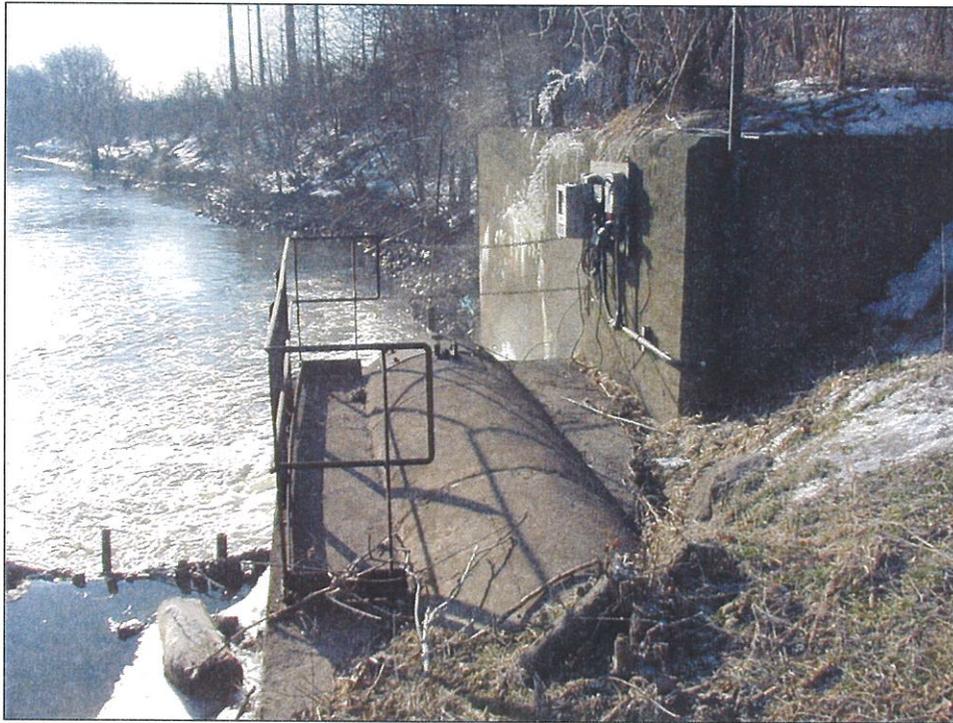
Republic Steel Warren Works Dam. View of west abutment and outlet pipe looking south.
